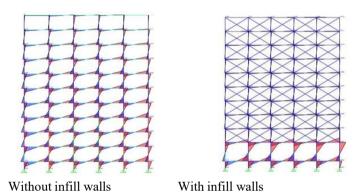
Forces in beams and columns in building with soft storey at ground level with and and without infill walls
